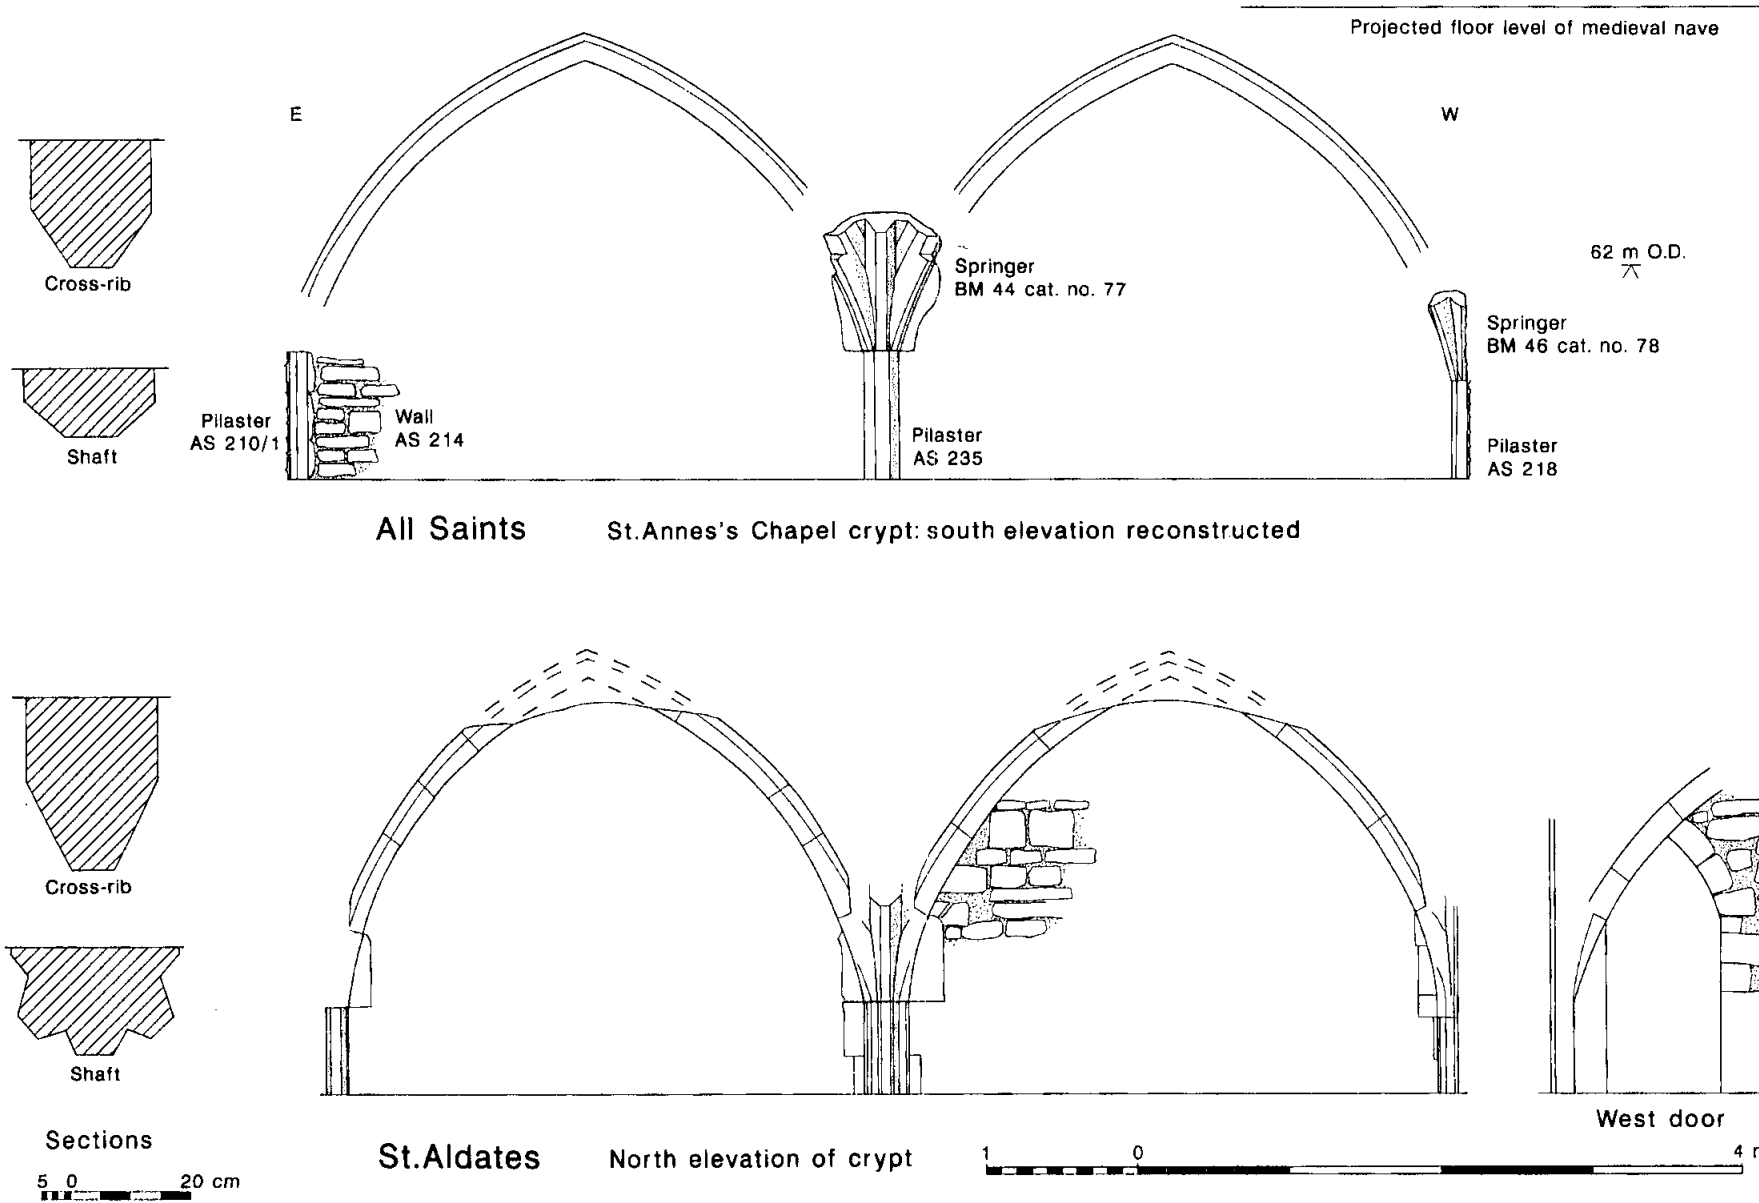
All Saints Church Trench I and salvage; conjectural S elevation of St Anne's Chapel crypt, with N elevation of crypt of St Aldate's Church.
